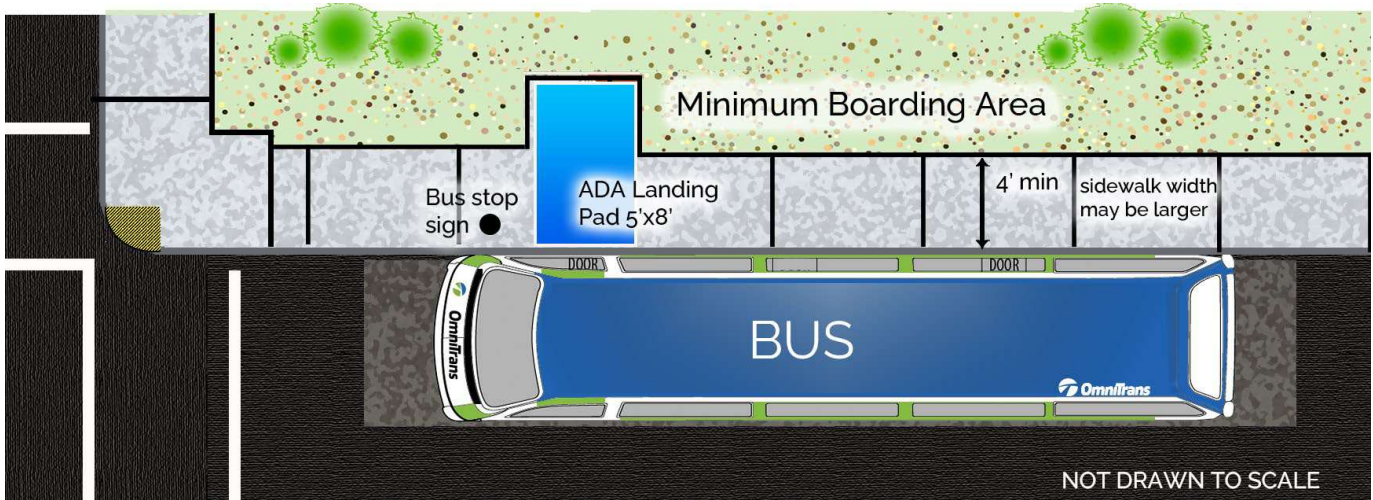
Minimum stop dimensions when sidewalk is adjacent to curb.
